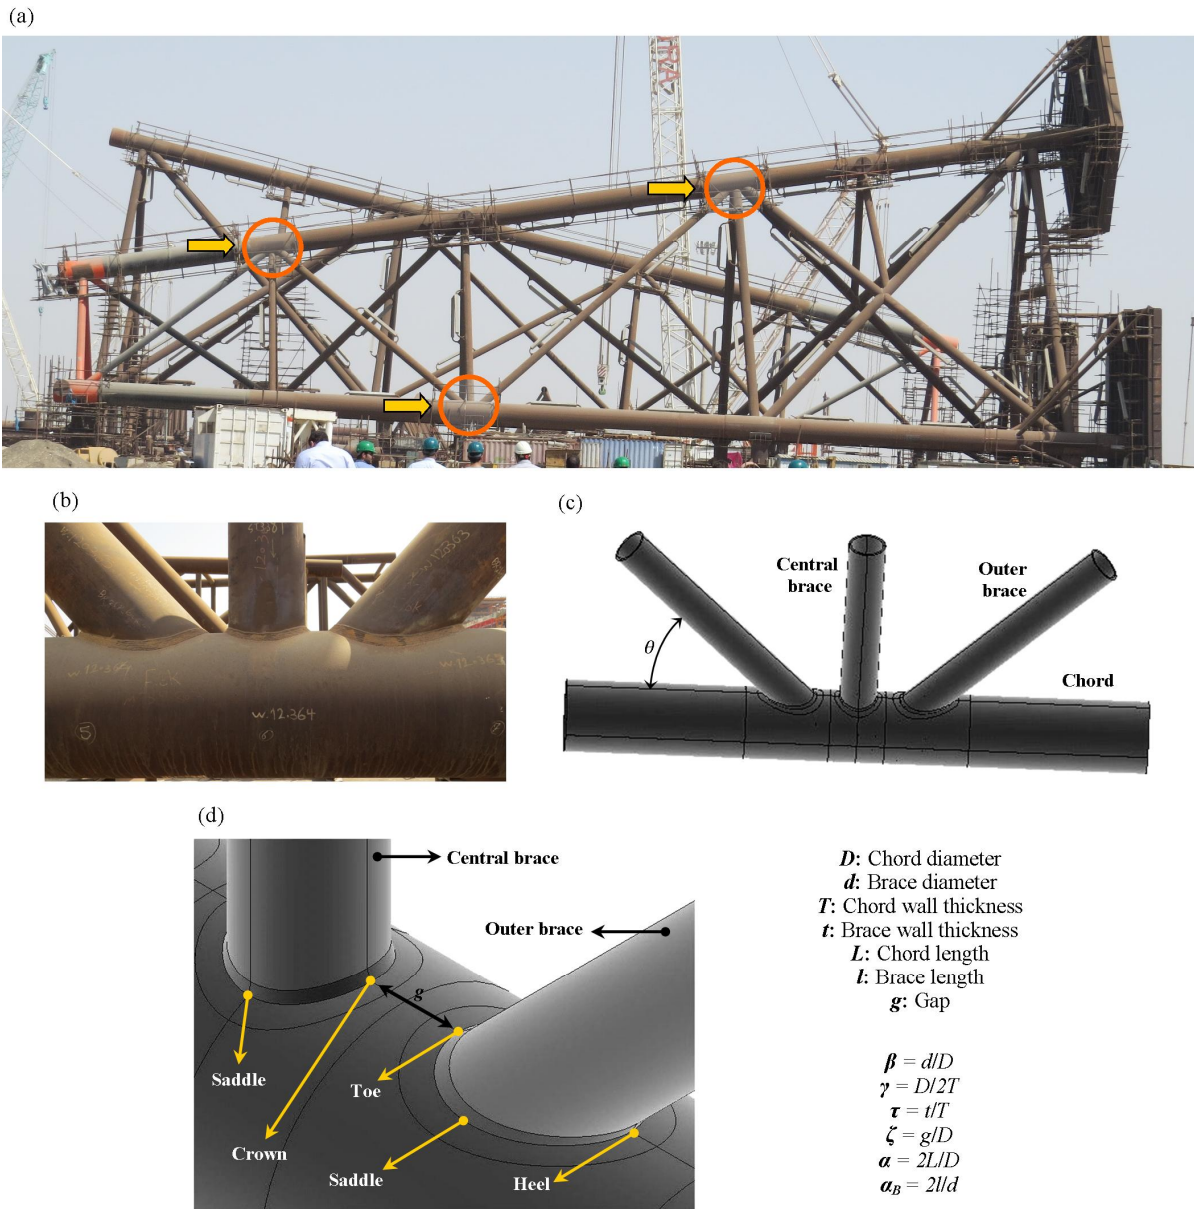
(a) Tubular KT-joints in a jacket structure during the fabrication, (b) Close view of a welded tubular KT-joint, (c) Geometrical notation for a tubular KT-joint, (d) Critical positions along the weld toe of central and outer braces
